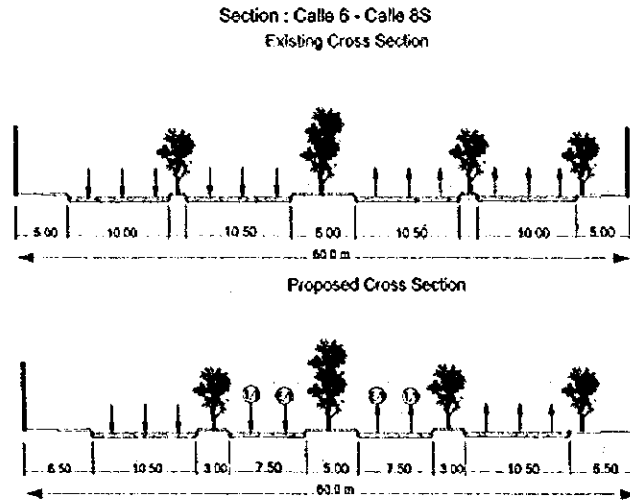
Typical Cross Section on Avenida Quito (6)
